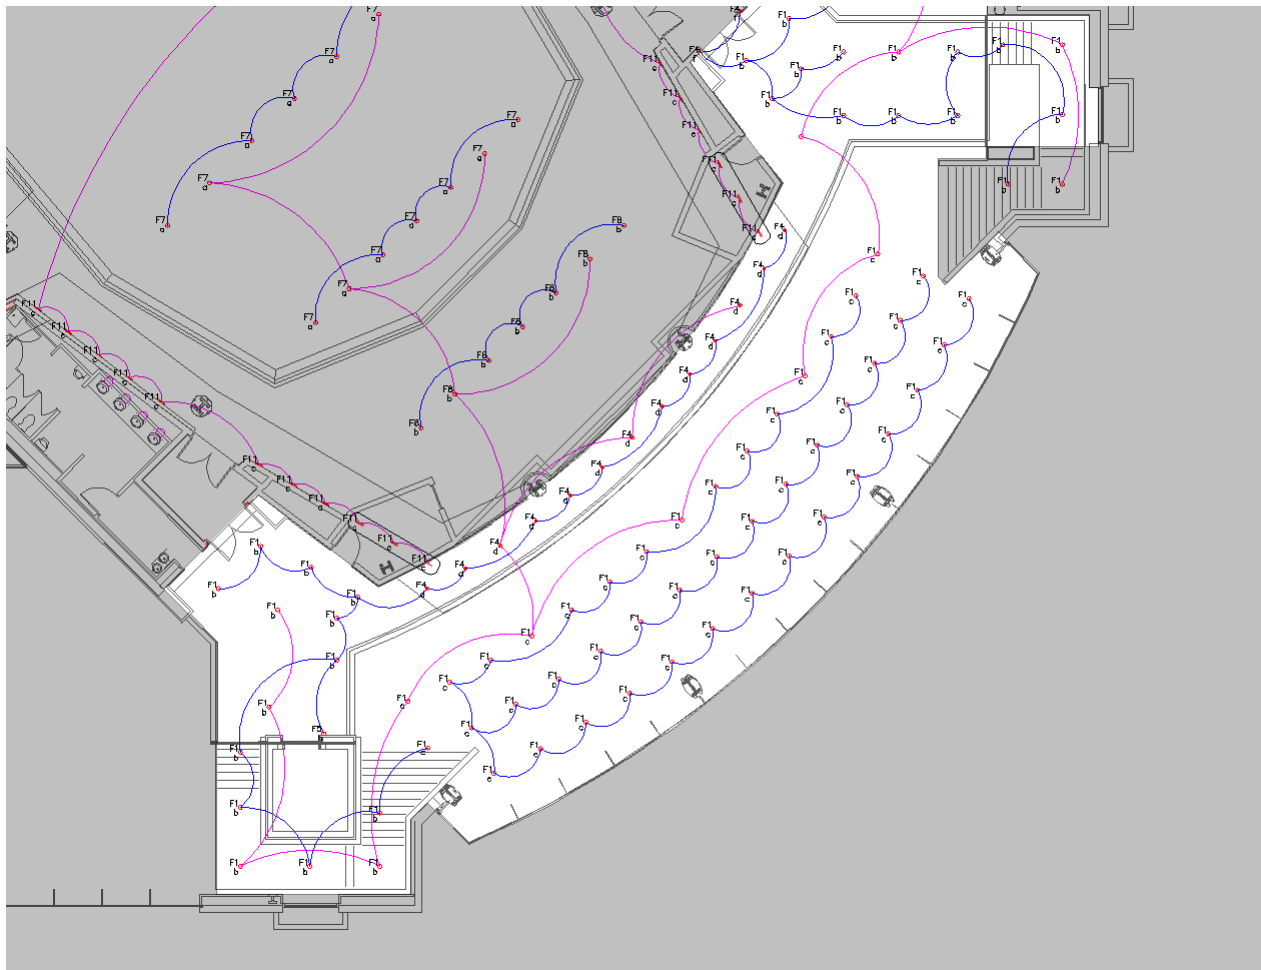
Main Lobby – Balcony Level South Lighting Plan
